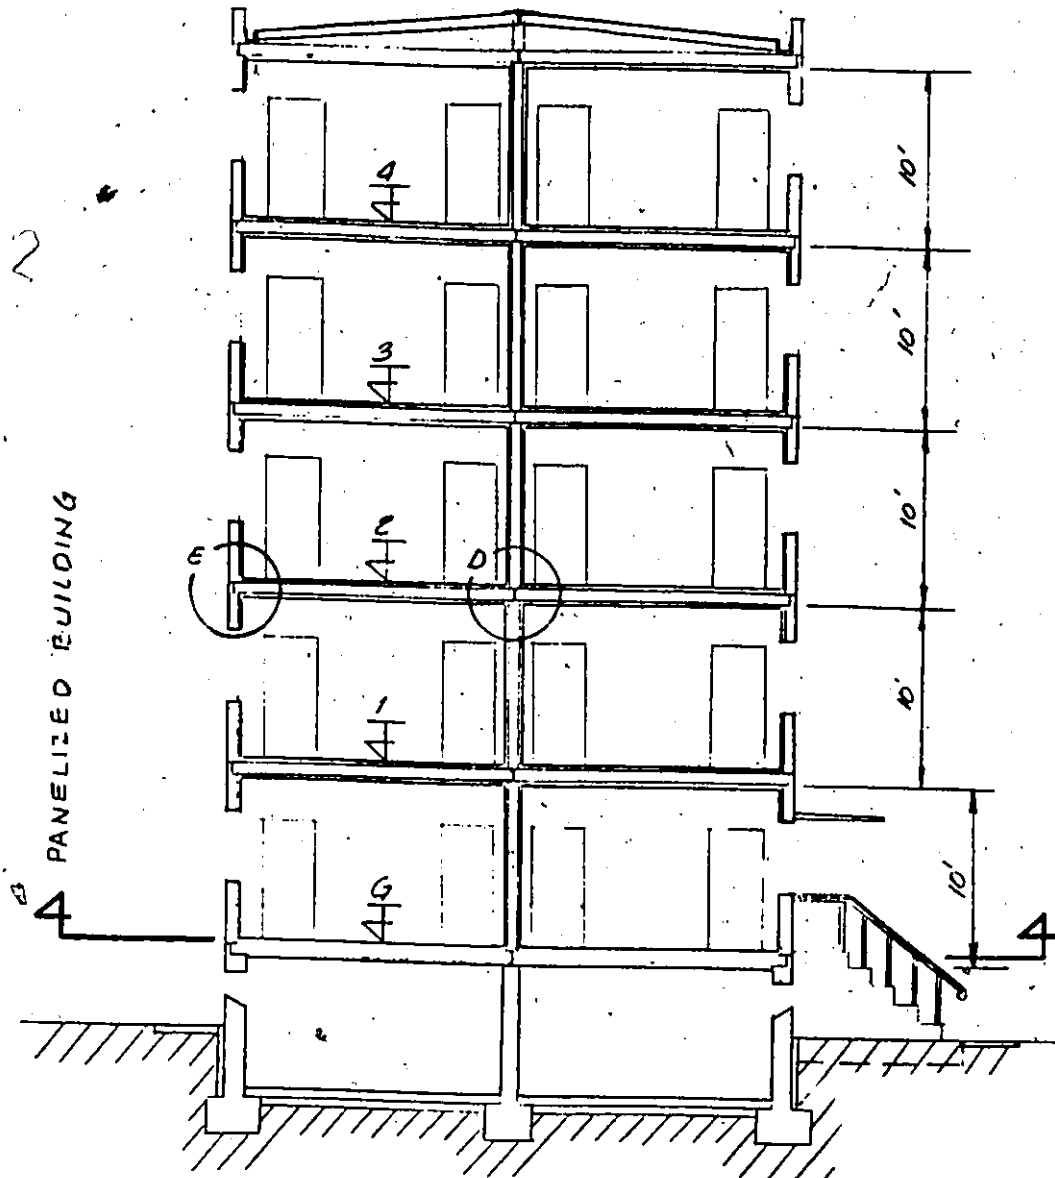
ELEVATION OF TYPICAL PANELIZED BUILDING
